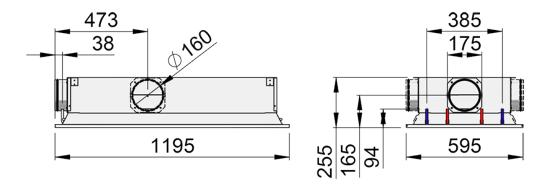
Halton Rex Expander dimensions (RXP-1200 with duct connection Ø 160 mm)
